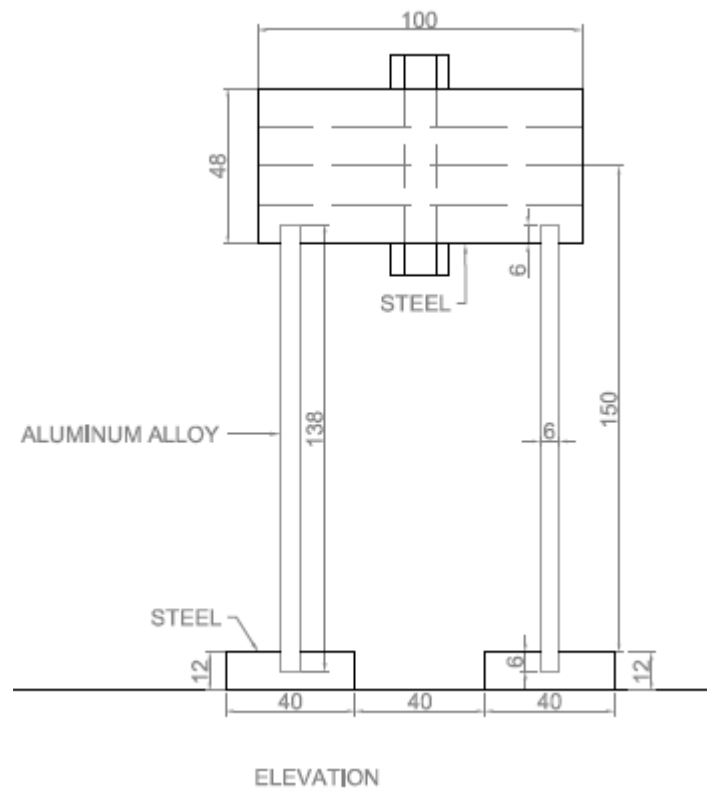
Structural elevation of long period structure (dimensions in mm at model scale)
